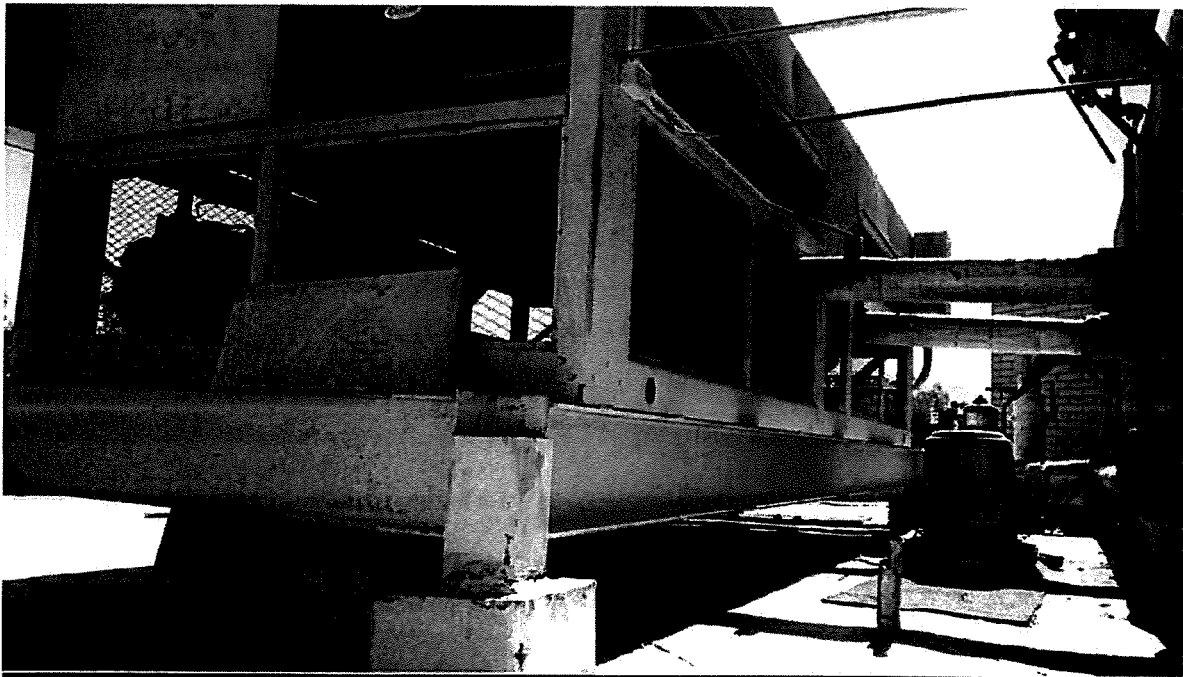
Existing chiller looking in opposite direction of Photo 1. Expansion tank racked on wall can be seen to the right.
